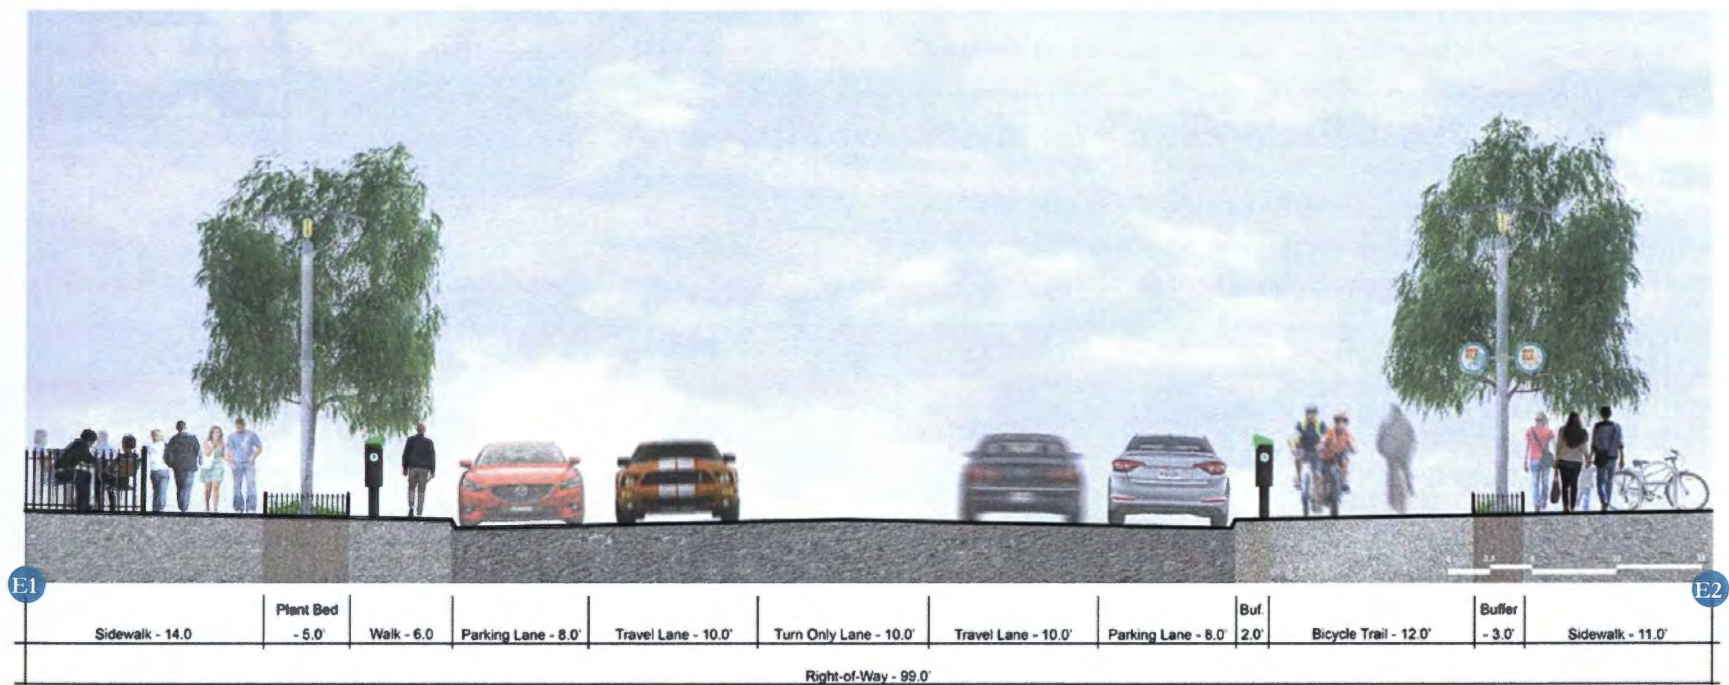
West 6th Street Between St. Clair Avenue and Johnson Court Proposed
